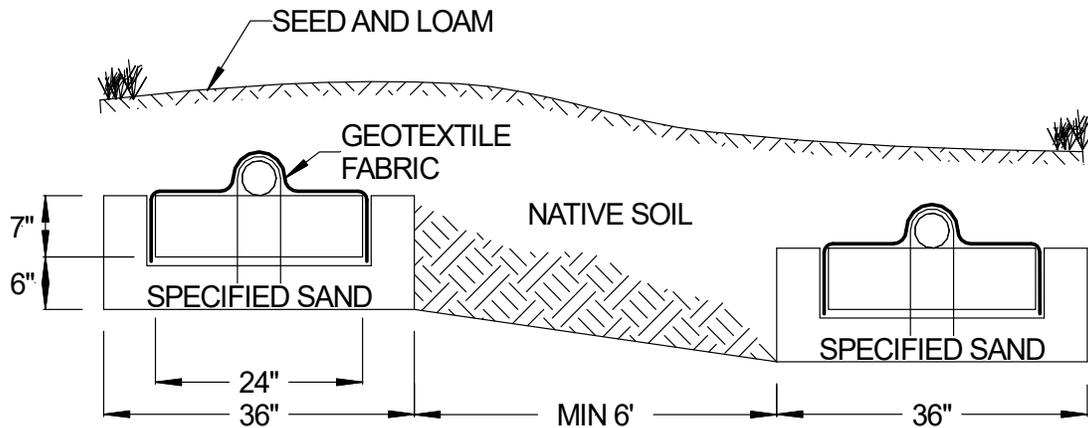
SECTION VIEW – TRENCH SYSTEM – SLOPING SITE
